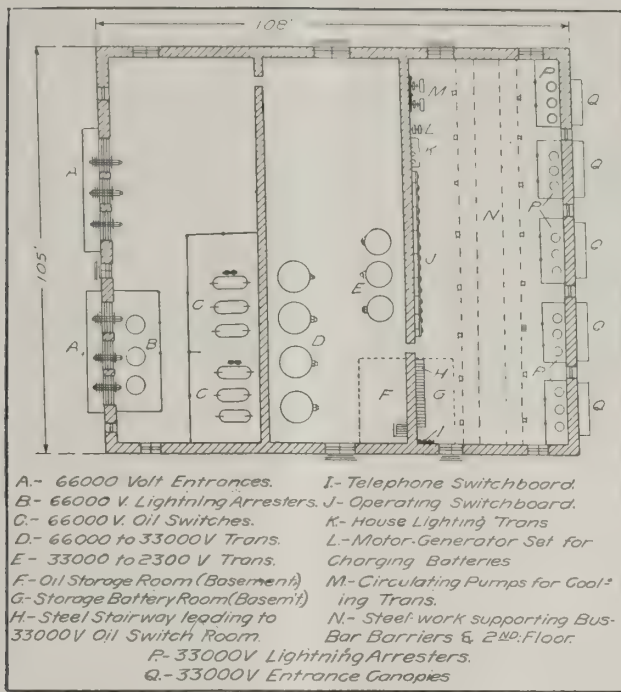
FLOOR PLAN OF THE JOPLIN SUB-STATION.
